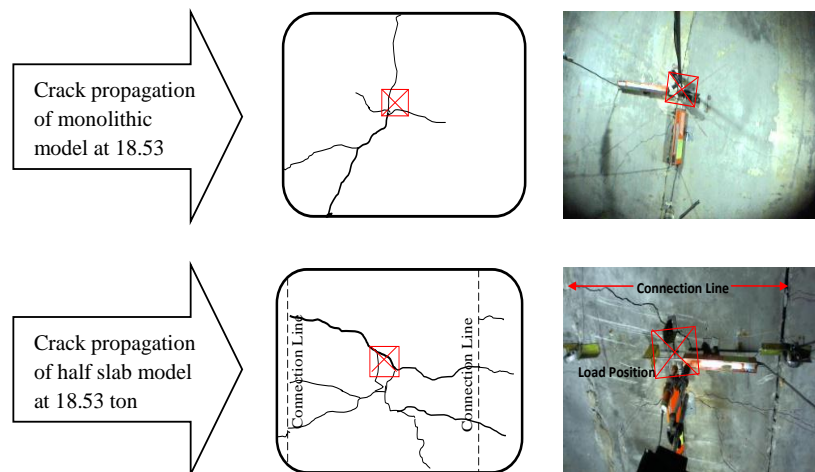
Initial crack of Monolithic and Half Slab Model at crack load
